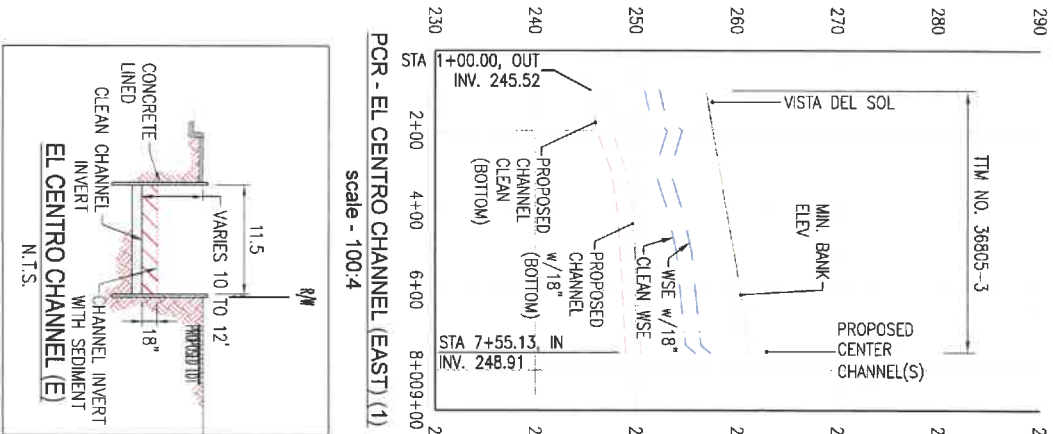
17520 Nonheize Street, Suite 700 Fountain Valley, CA 92708 P: (714) 951-7300 www.pacewater.com	SCALE AS SHOWN DESIGNED B.M.P. DRAWN A.E. CHECKED DATE 9/26/17 JOB NO. A591	JOB PALM CREEK RANCH FLOOD HAZARD IMPACTS	TITLE CHANNEL / CULVERT PROFILES
